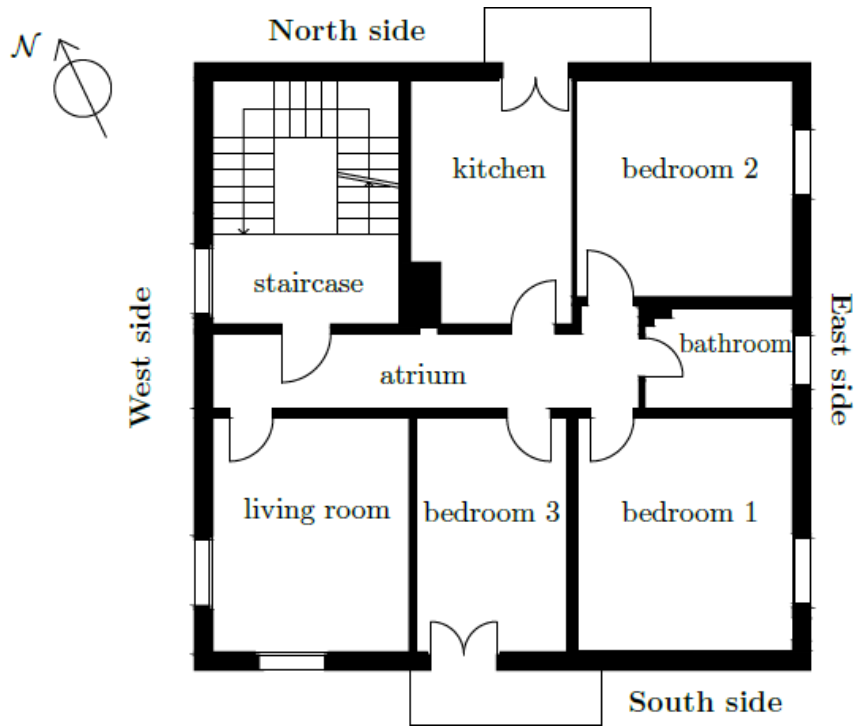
Apartment floor plan of the masonry building located in Bologna.
